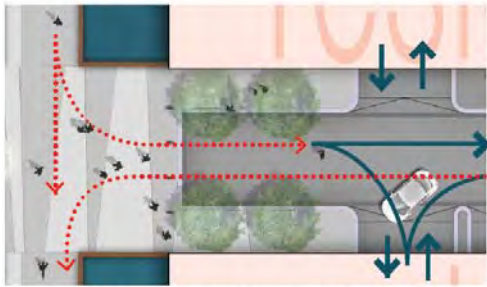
Indicative traffic circulation at Yarra Walk and Laneway intersection.
